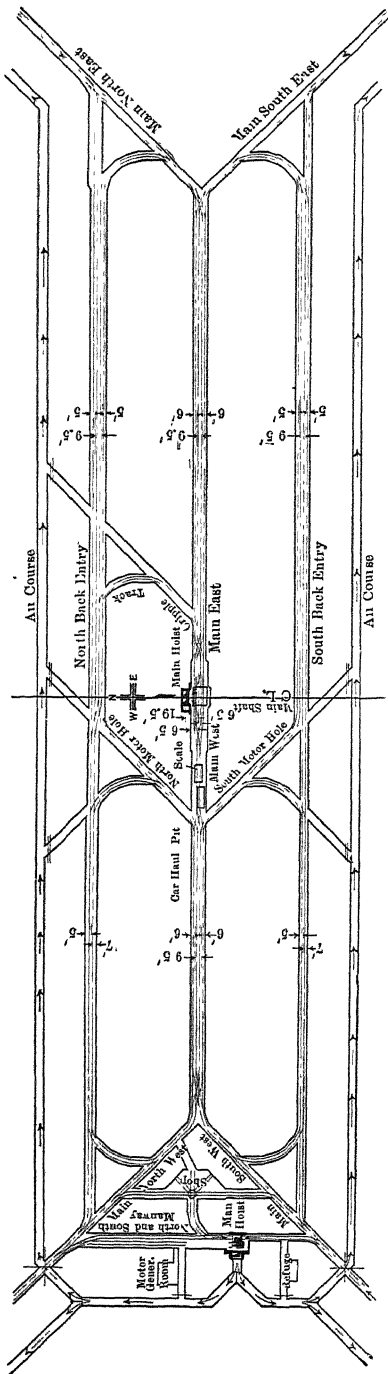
BOTTOM LAYOUT, STANDARD OIL CO. SHAFT.
